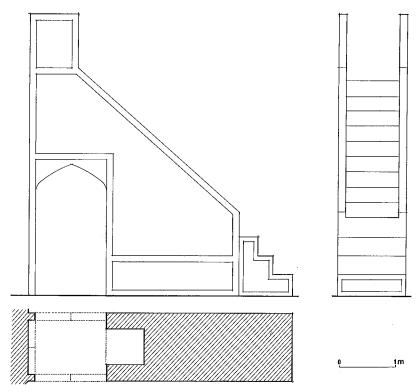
Bundarābād, complex: plan and elevation of minbar.
